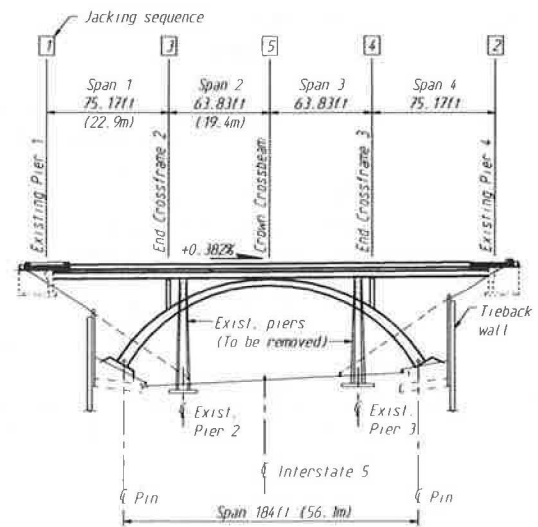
Elevation, Capitol Boulevard Bridge.
